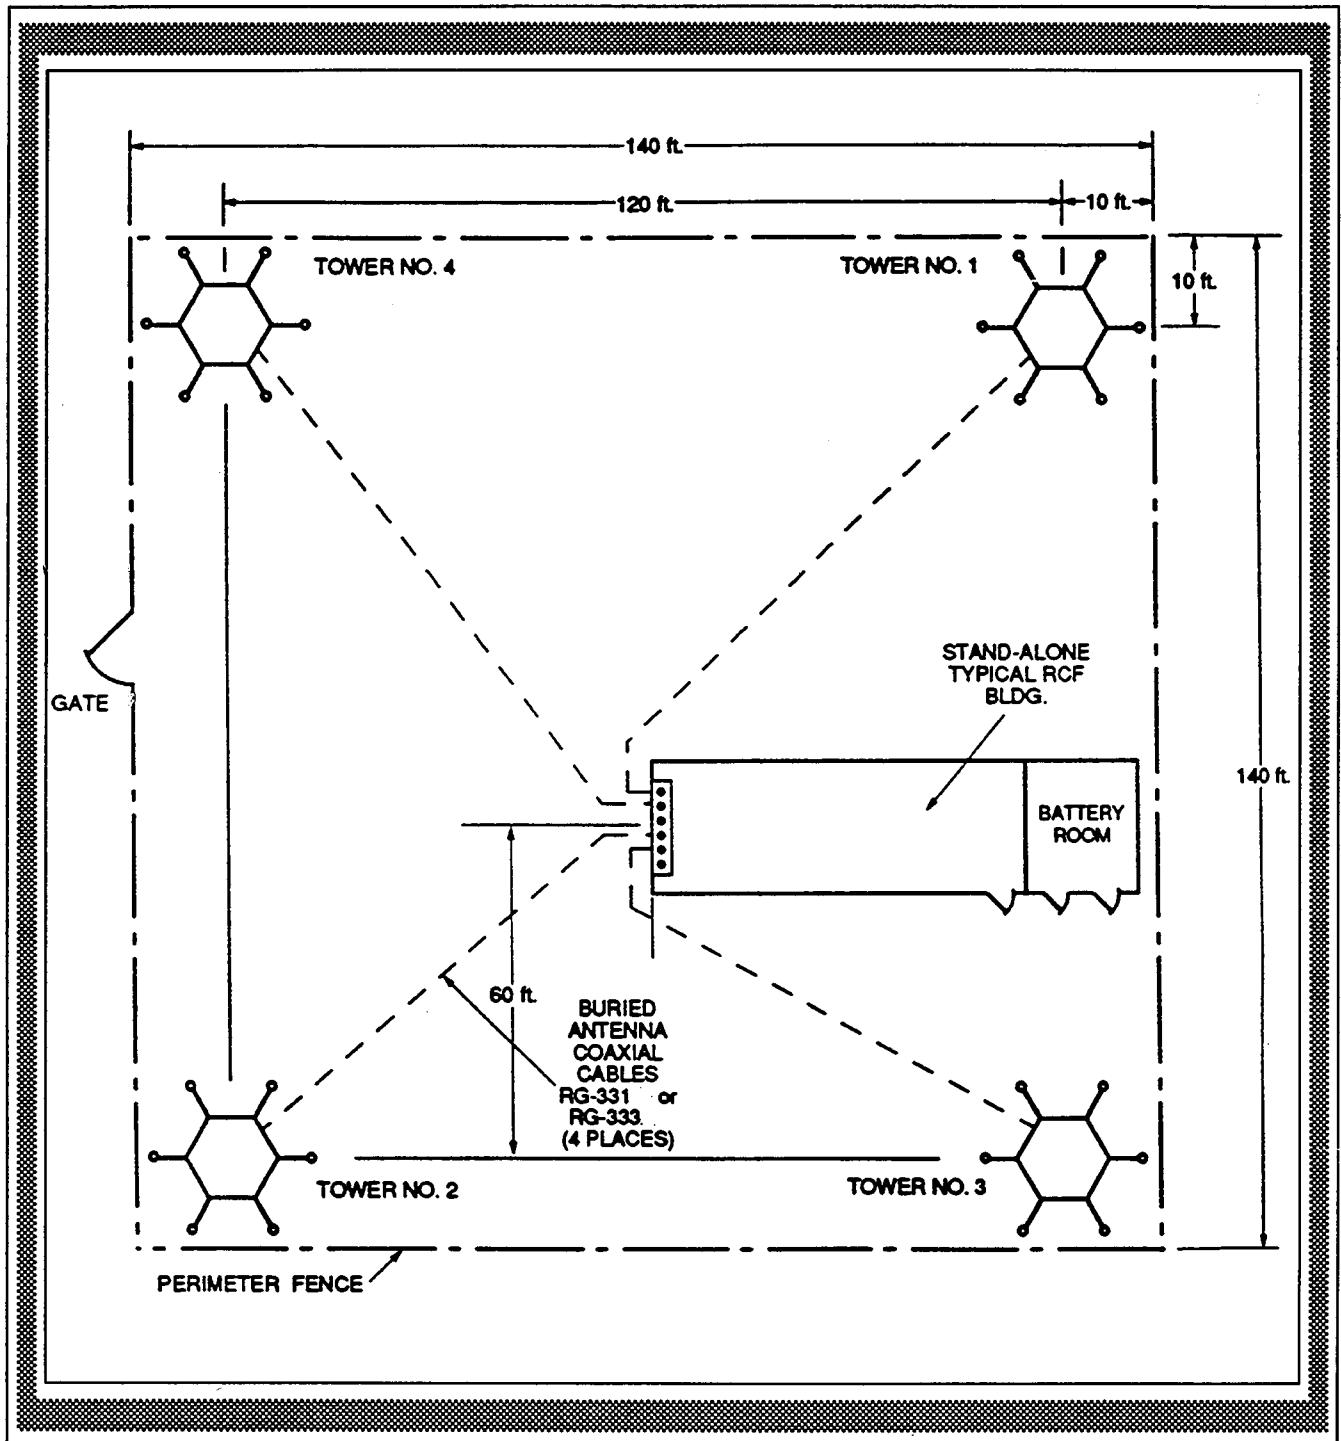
STAND-ALONE RCF SITE LAYOUT
